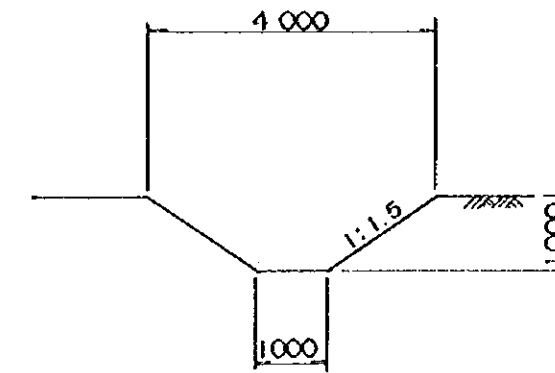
Cross Section of the Irrigation/Drainage Canal
